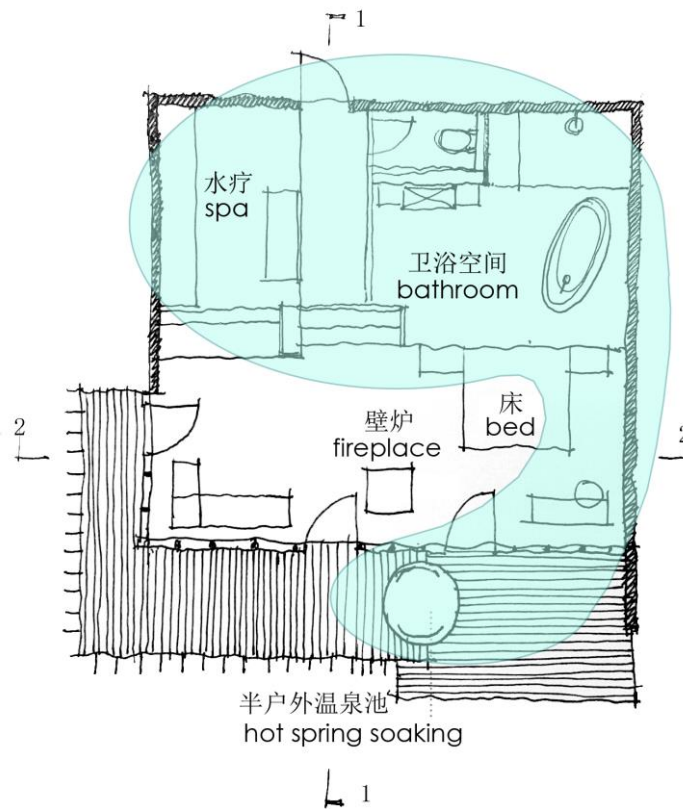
Guest room plan layout of Hotel Wiesergut
